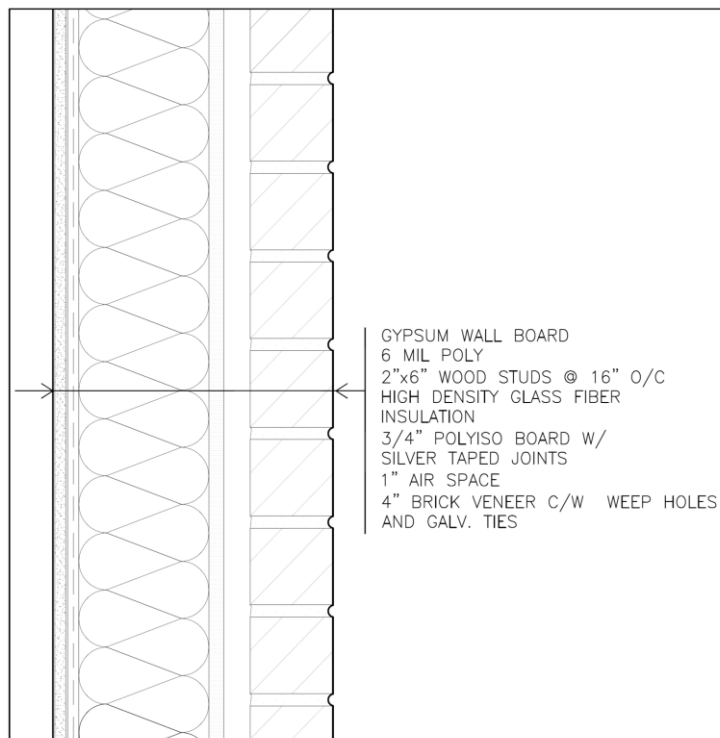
Wall Assembly Cross-Section (Twiddy, 2011)
